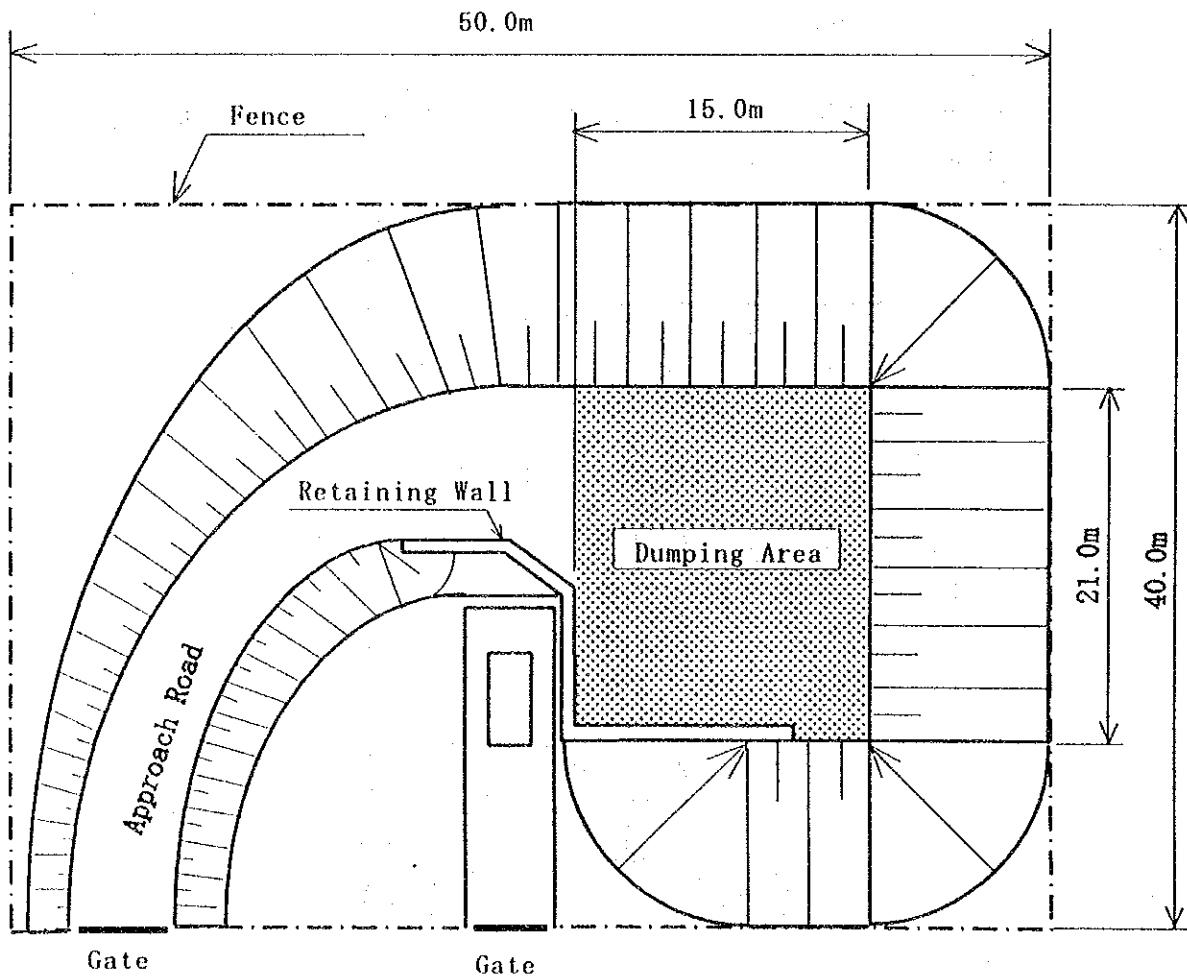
Plan of Transfer Station (Direct Re-Loading Type)
